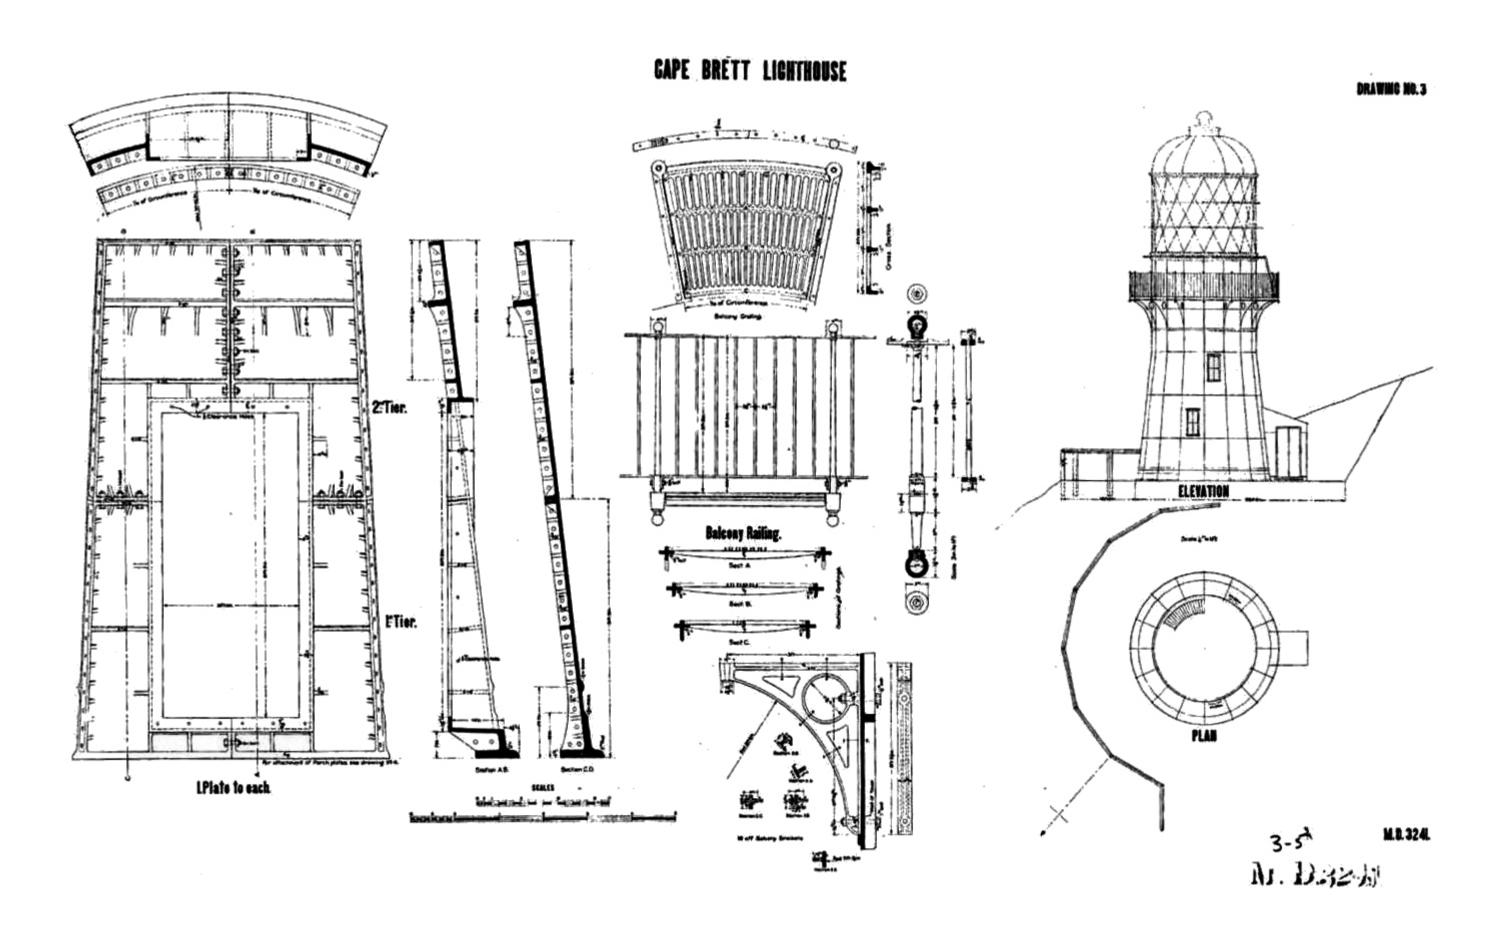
The architectural plans for the lighthouse –Drawing No 2.
